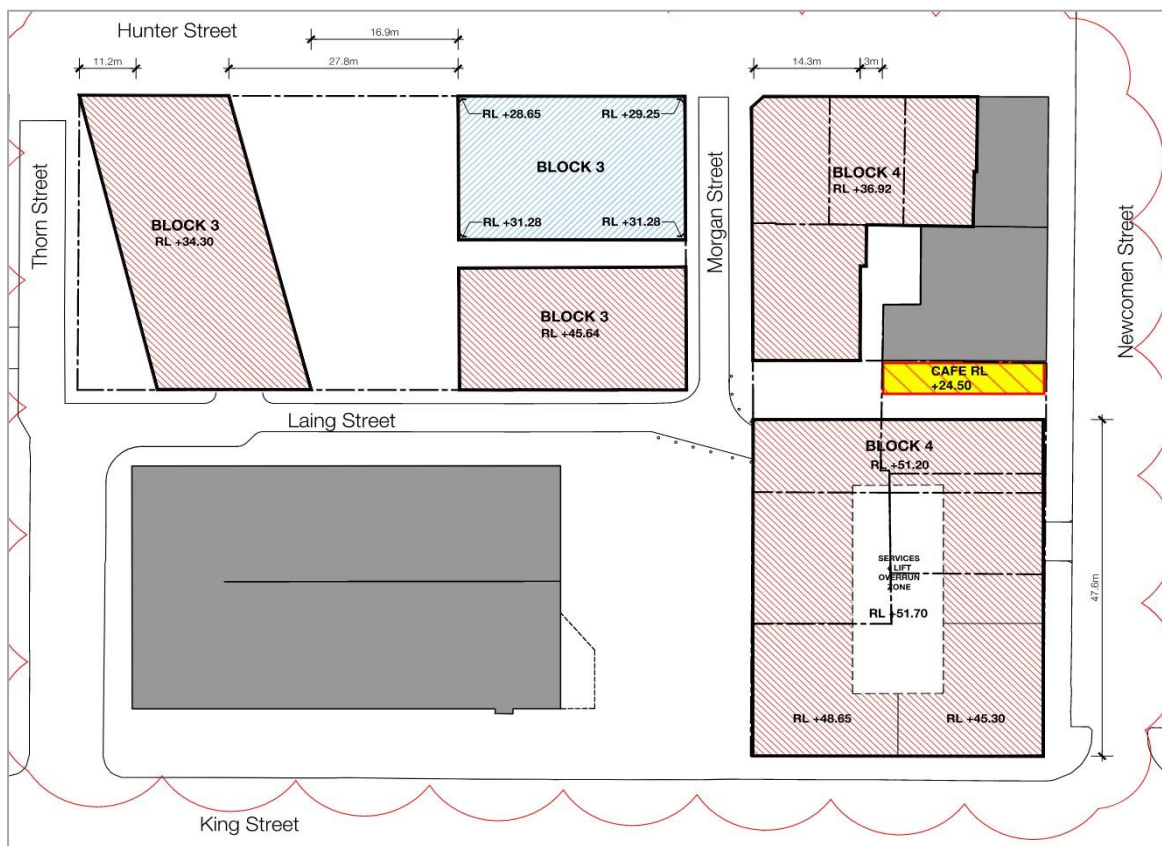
Proposed envelope/height plan. *Source: Urbis
